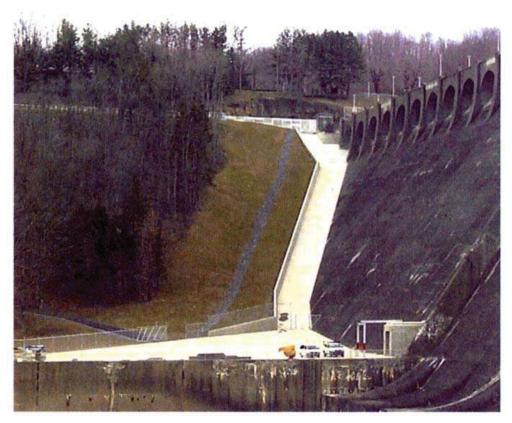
Concrete Paving and Channel Along Downstream Right Abutment (Courtesy of USACE).
